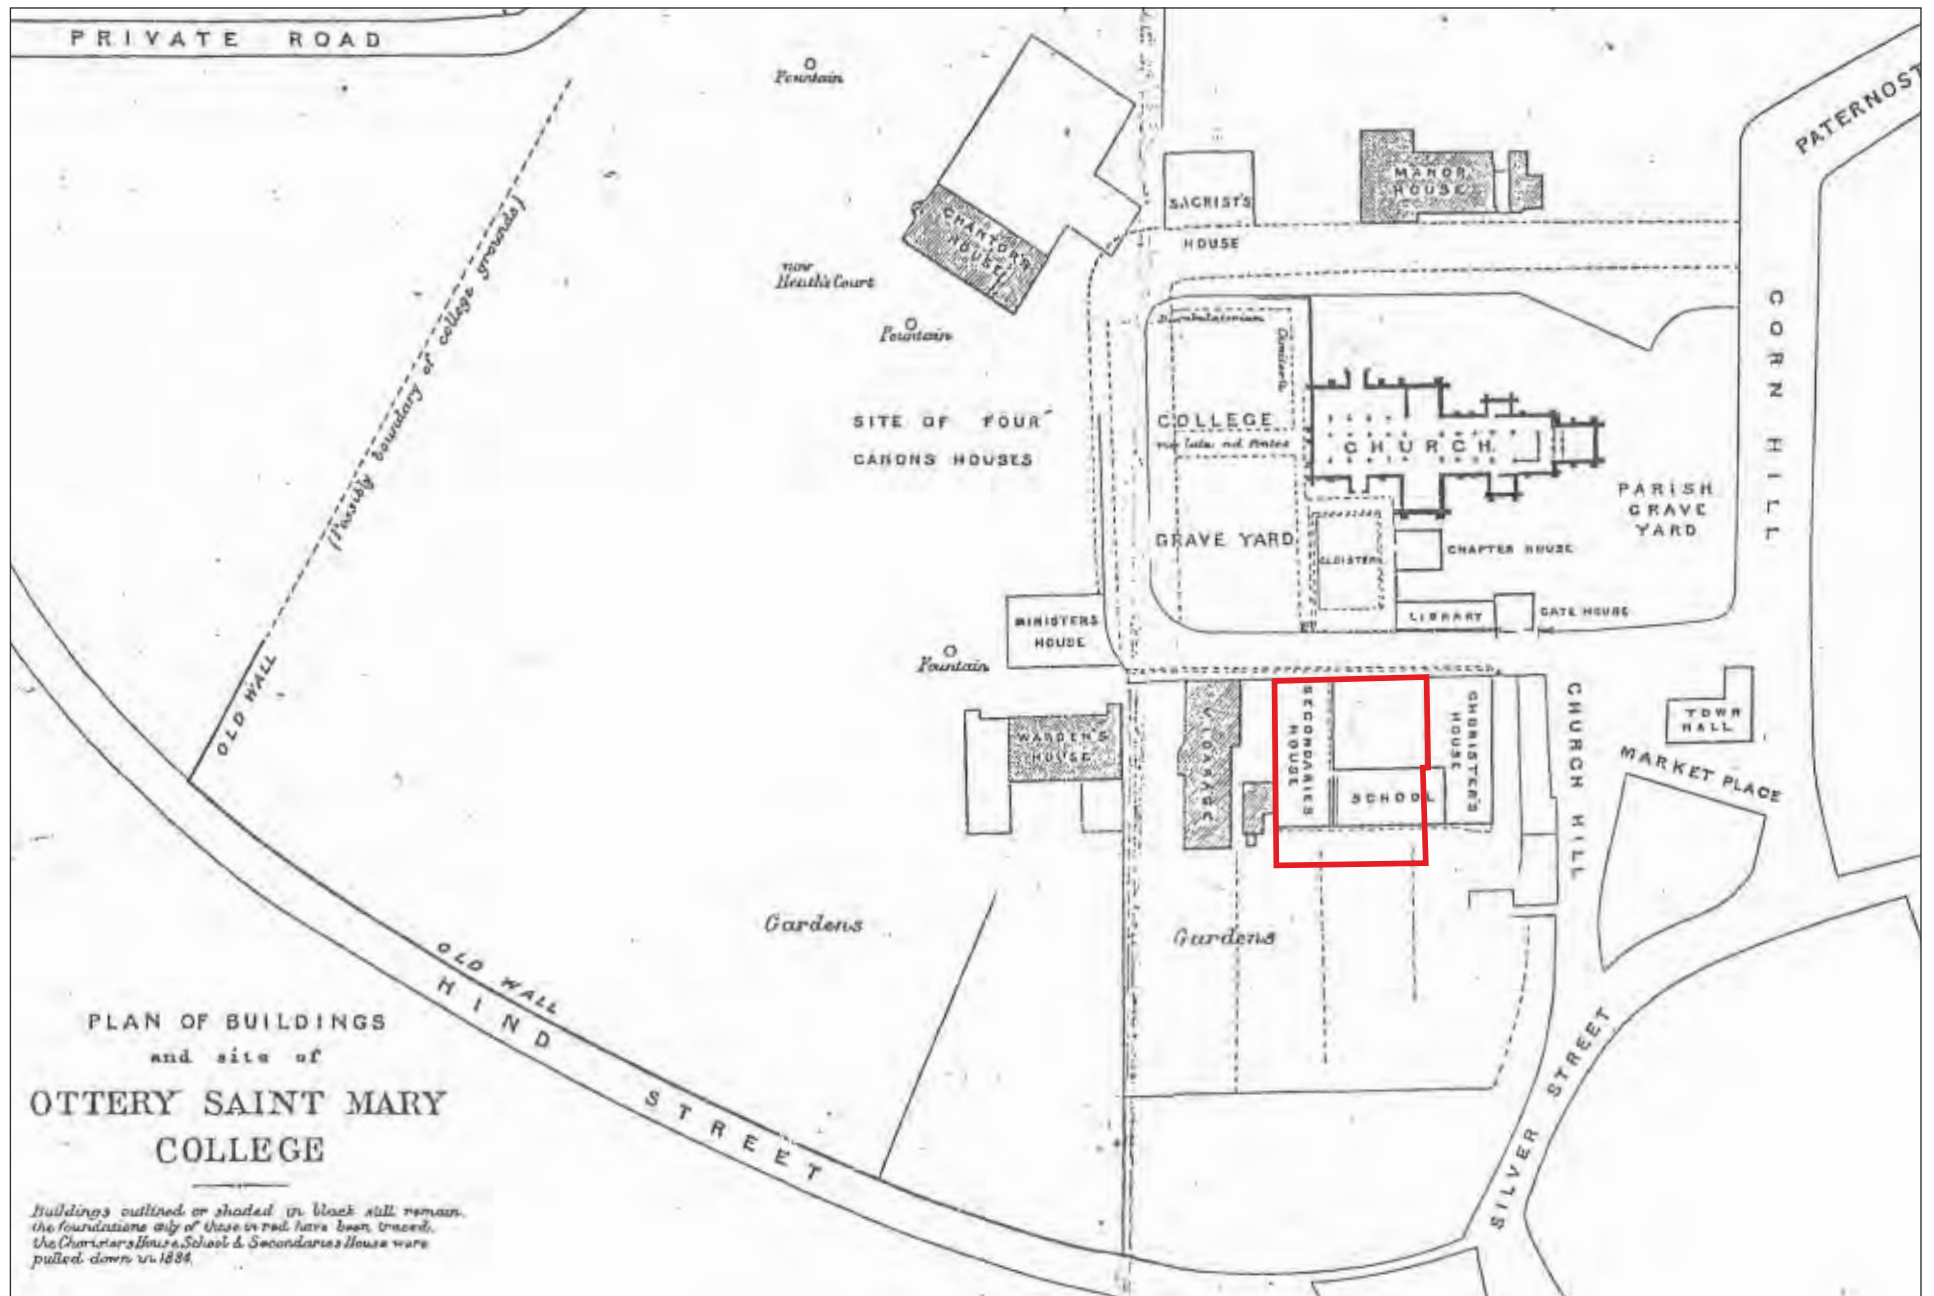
Plan showing location of site and suggested reconstruction of medieval Collegiate Church (reproduced from Dalton 1917).
